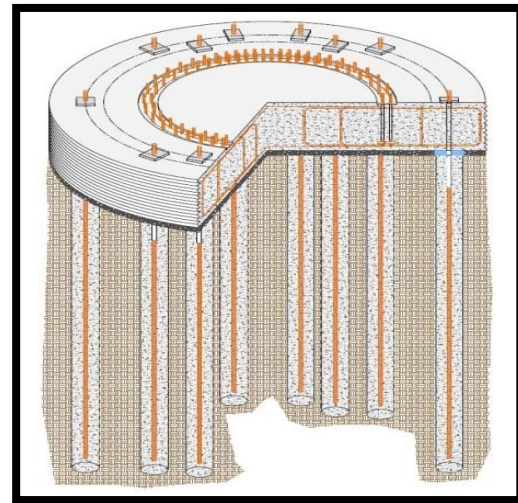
Rock-anchor multi pile foundation (Earth Systems Global, inc, 2011)
